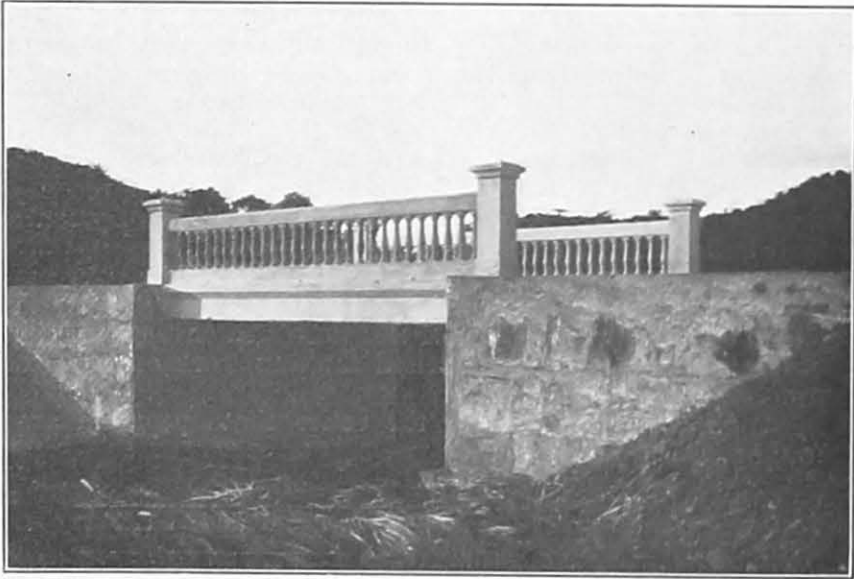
Concrete bridge in Pernambuco on the road from Recife south toward Alagoas
